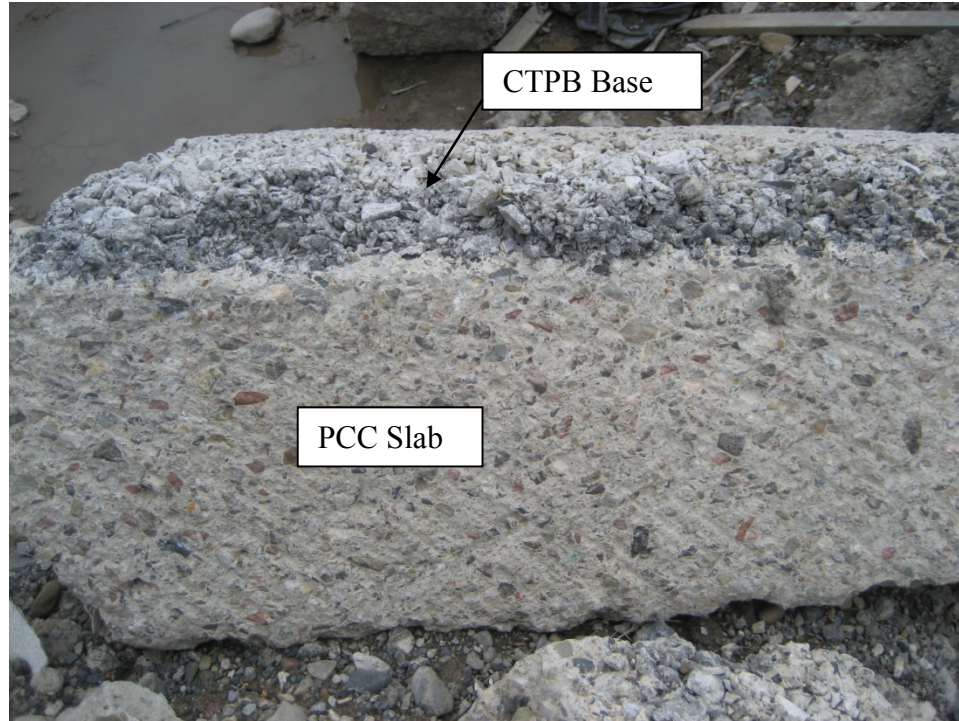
Bonded CTPB and PCC slab in refuse pile at construction site
